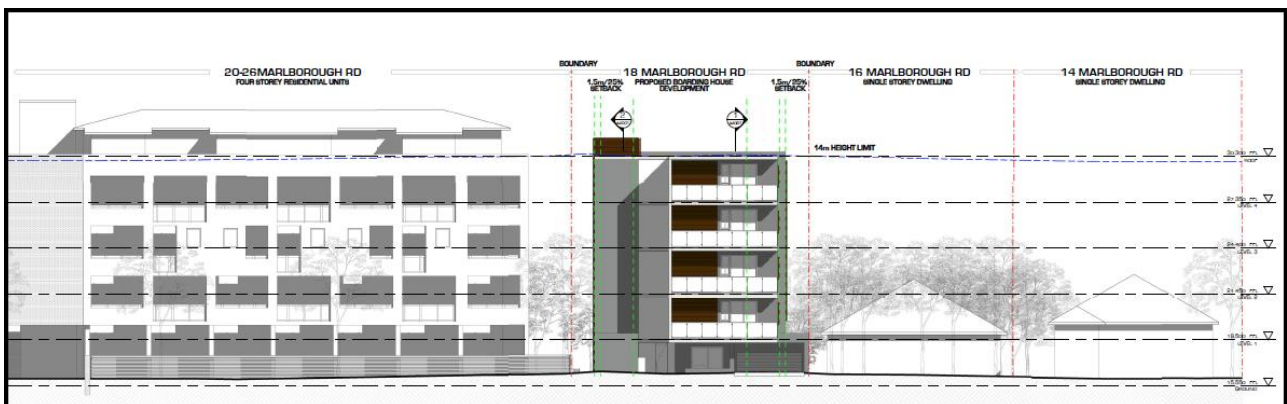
Front (Marlborough Road) Elevation of the proposed development illustrating height non-compliance
